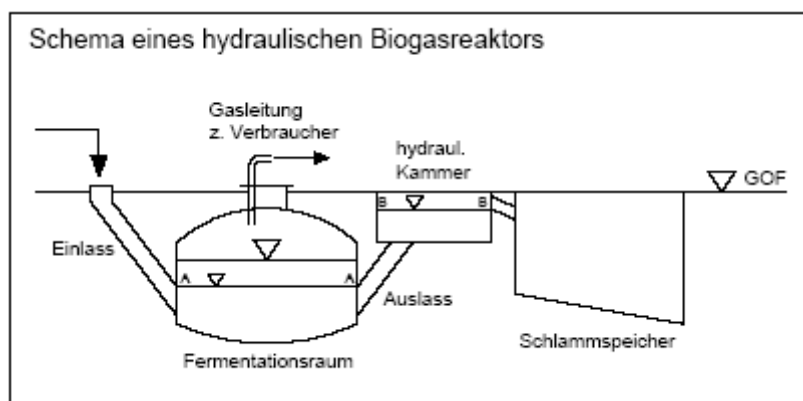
Scheme of a hydraulic Biogas installation.
